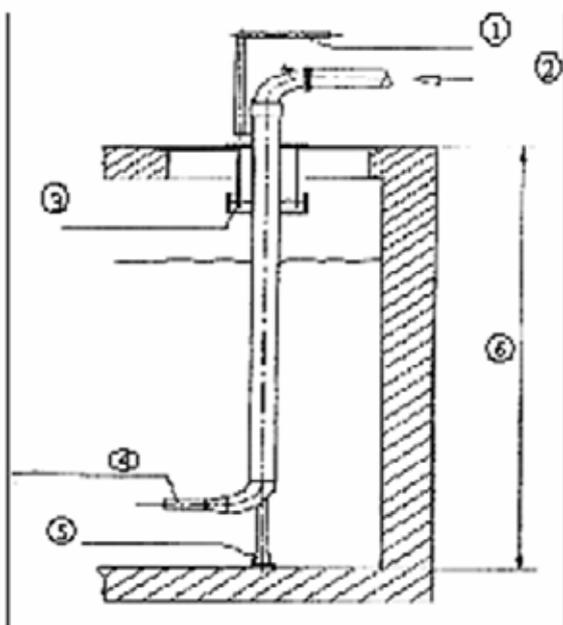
Hydraulic stirring mechanism, rotating type (KTS)
